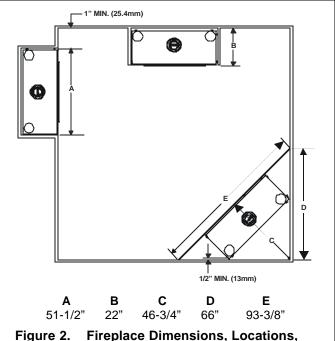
Fireplace Dimensions, Locations, and Space Requirements
